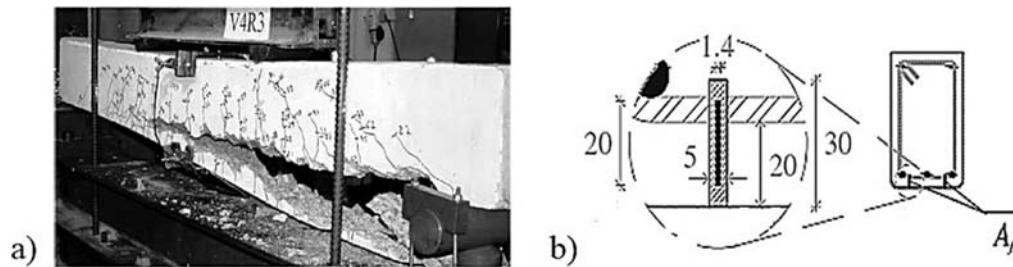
a) Concrete cover delamination failure (Barros et al. 2007), b) cutting the bottom arm of the steel stirrups (Costa and Barros 2009b)
